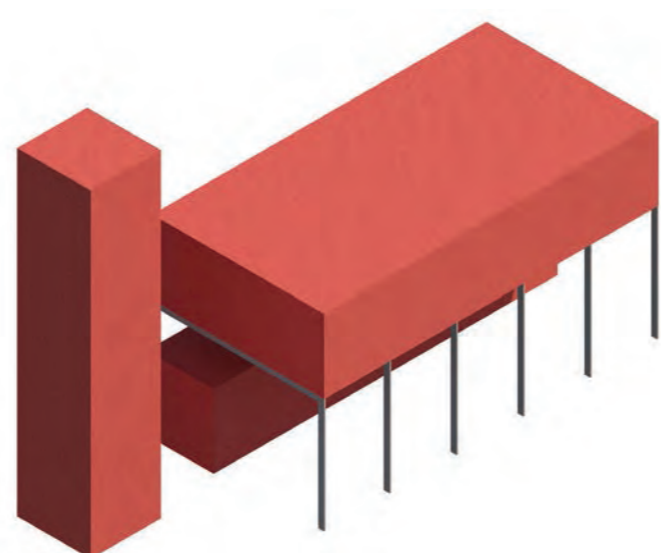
SHIPPING CONTAINERS AS PART OF BUILDING STRUCTURE
